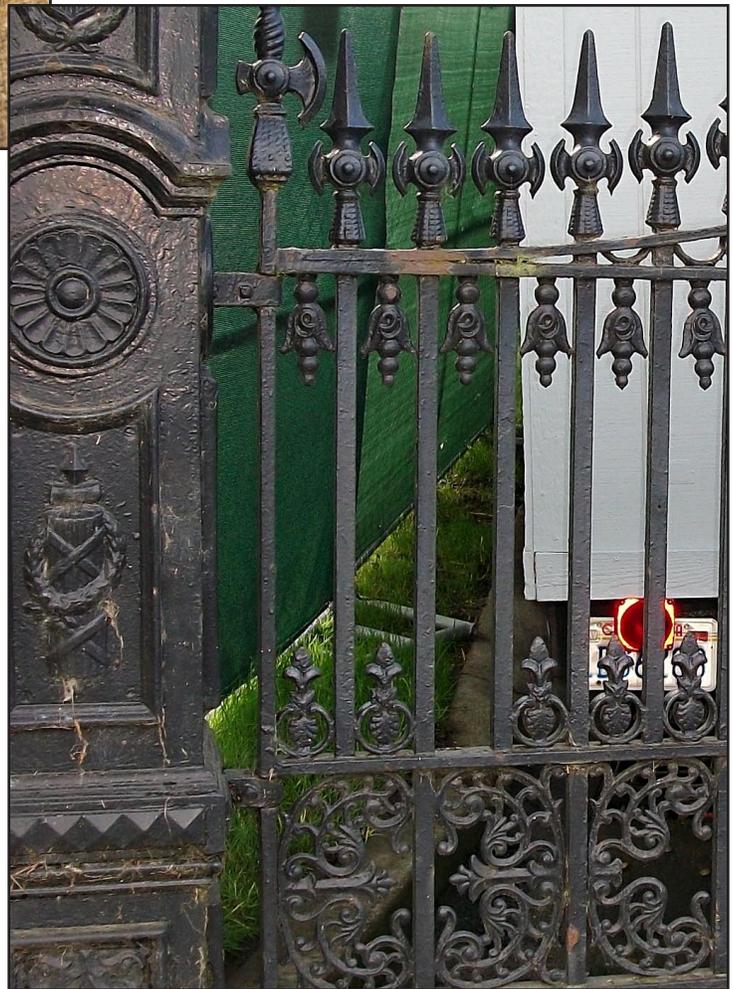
Rust and missing finial at pedestrian gate, facing south.
